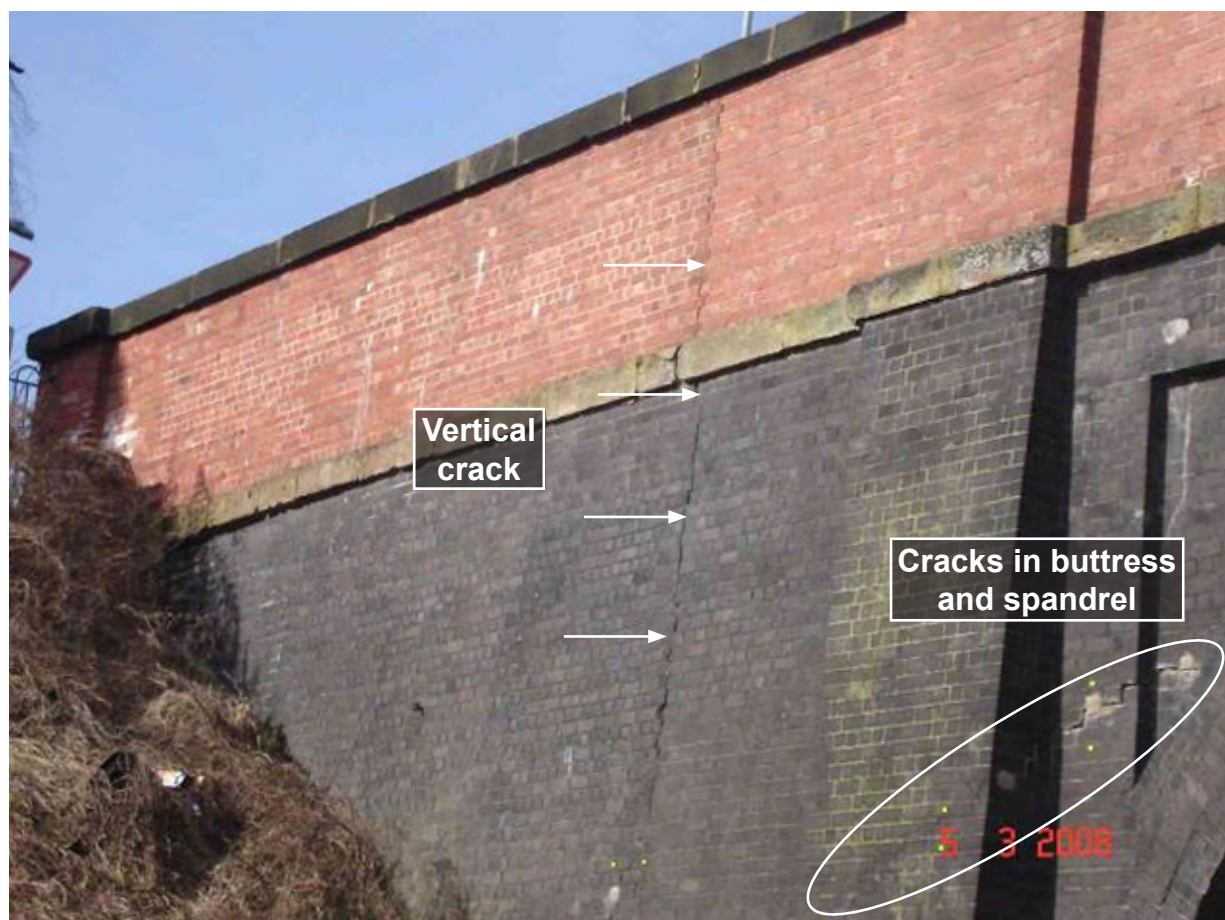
Vertical crack in Sileby wing wall and parapet (image courtesy of Network Rail)
